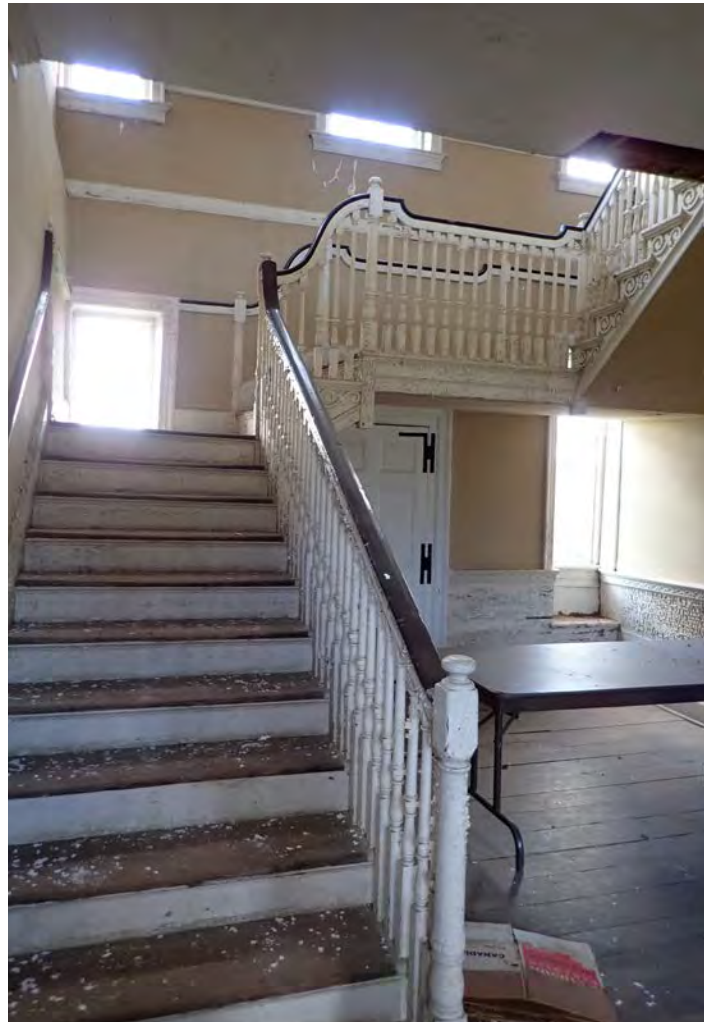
Interior of the Harmony Hall House - Central Hall, First Floor, Main Block (2020)
